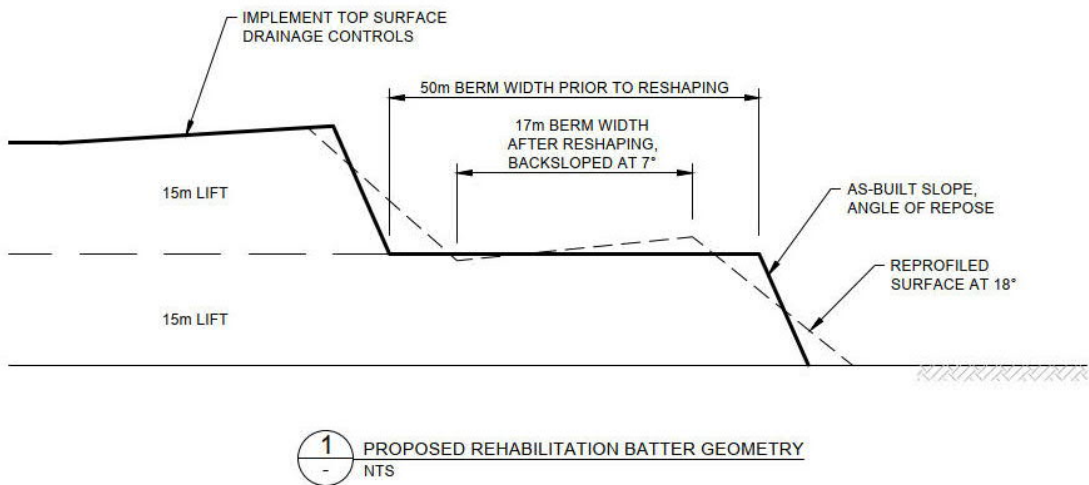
B: Typical Cross Section TSF Rehabilitation Slope
